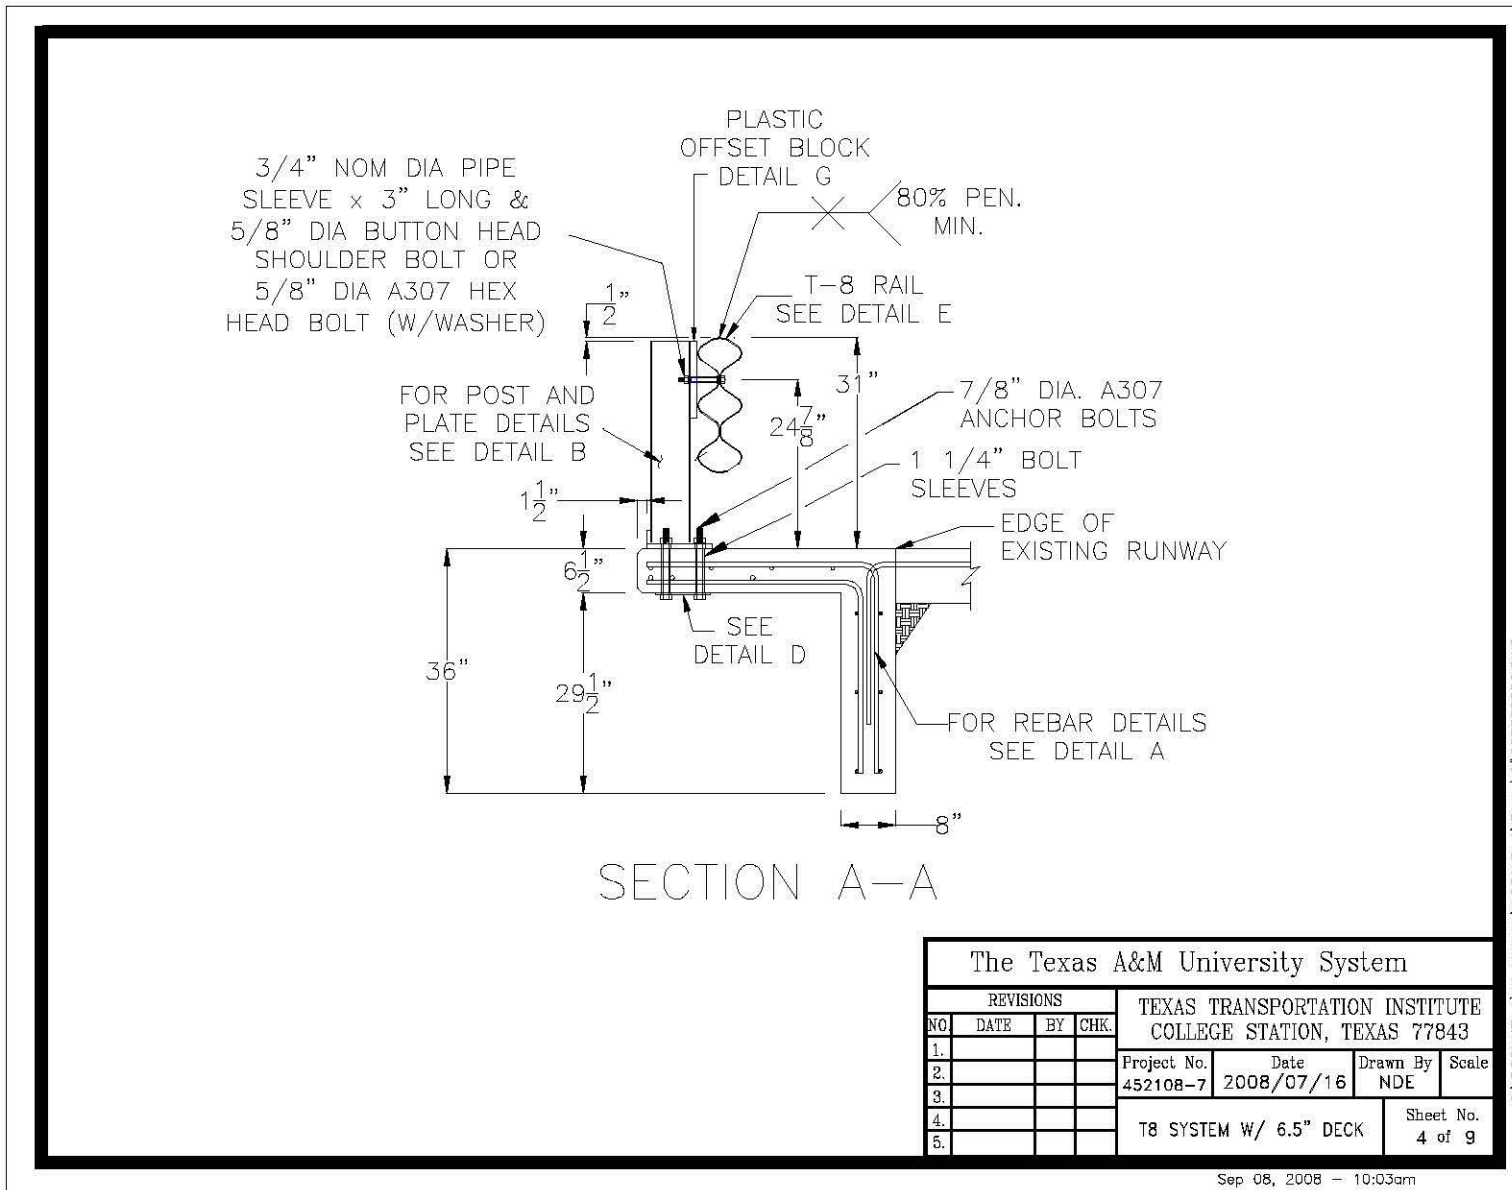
Details of the T8 Bridge Rail Installation – Cross Section.
